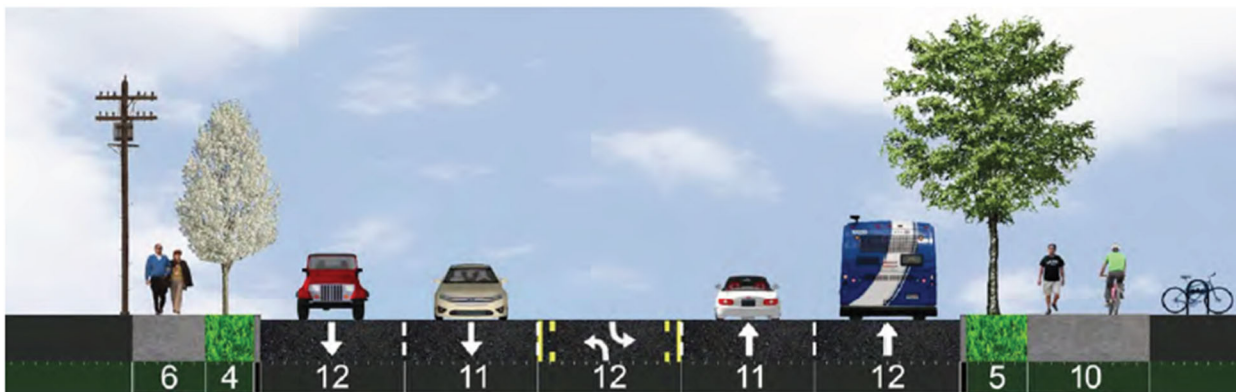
Proposed Corridor Lane Widths and Pedestrian/Bike Facilities
